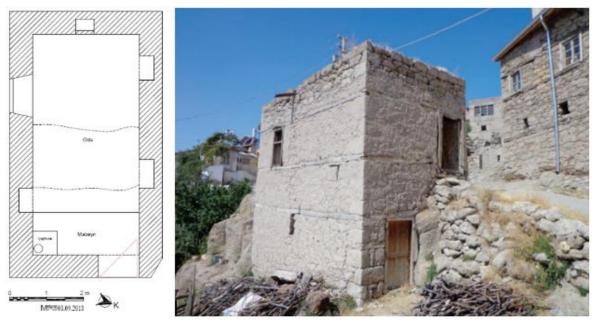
Konya Göktürk (Kilistra) Village Room, Left: Plan of the Room, Right: General View of the Room (Bozkurt, 2016).
